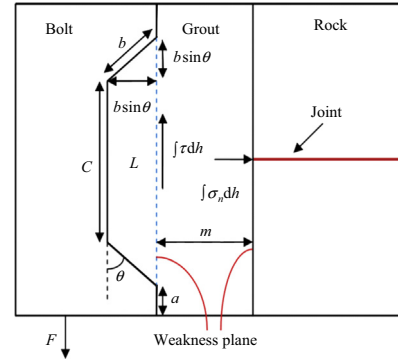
Load transfer between the bolt, grout and jointed rock.
